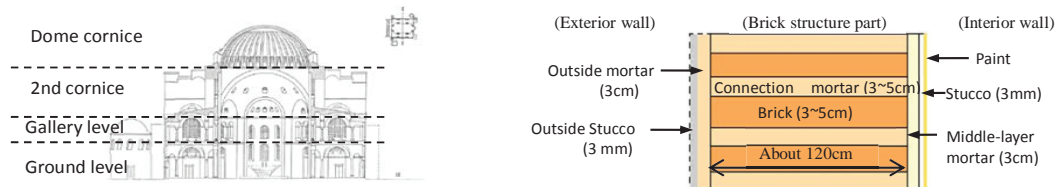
Sections (left) and wall structure (right) of Hagia Sophia.
